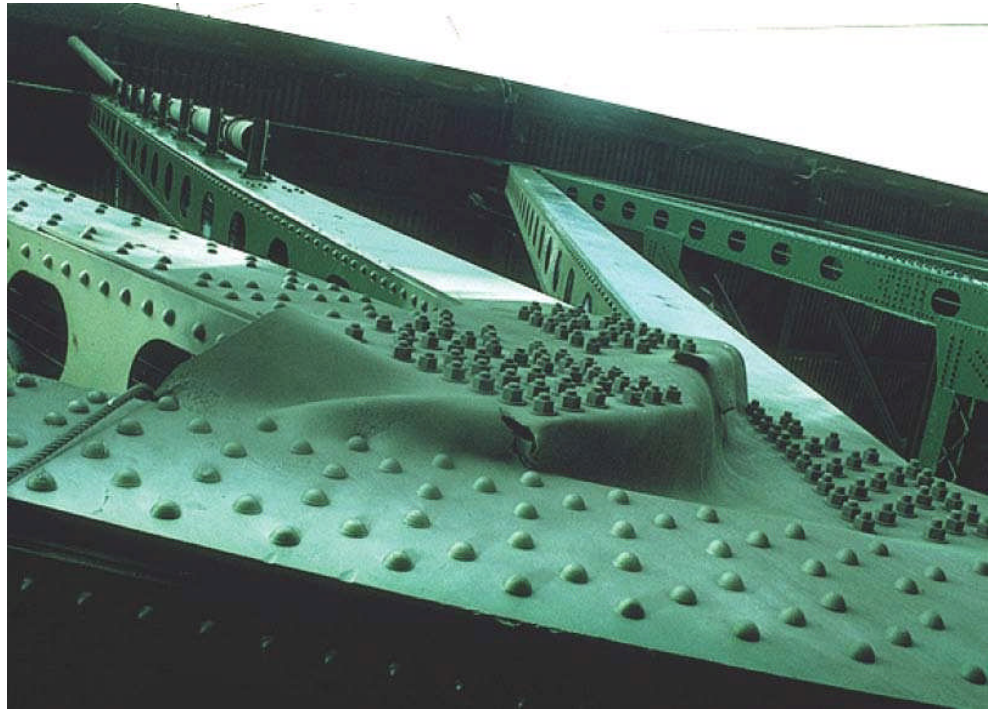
Gusset Plate Buckling (Compression) Failure due to Major Gusset Plate Section Loss
